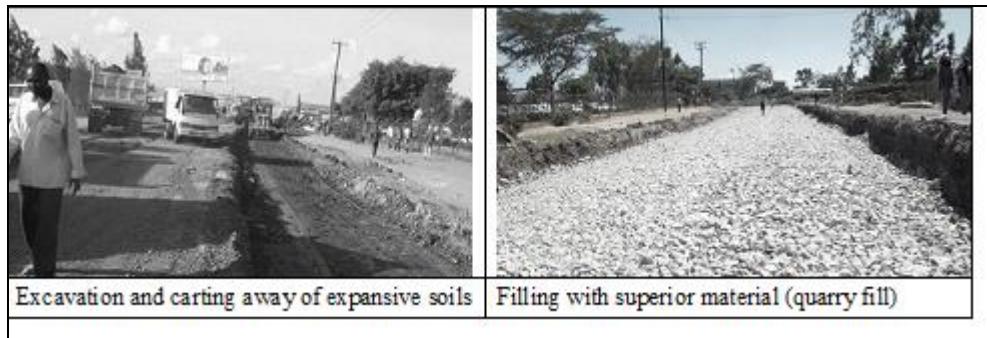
Cutting and filling activities during construction of Enterprise Road
